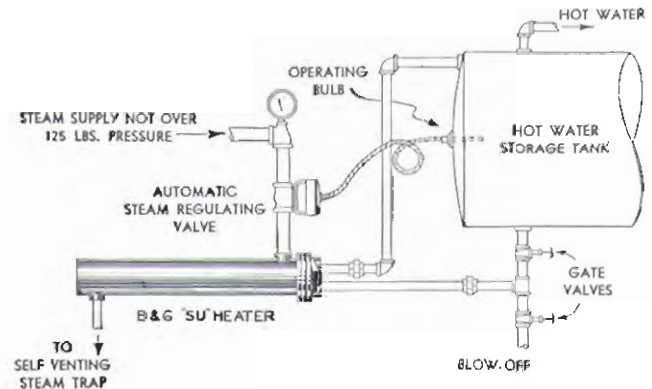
B & G 2-pass Type "SU" Heater using high pressure steam.
